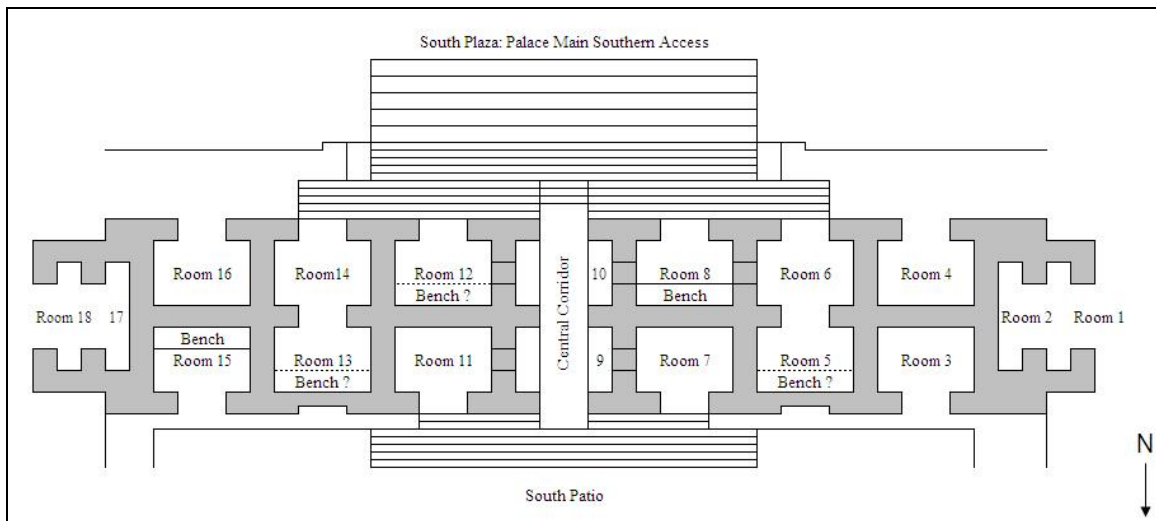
Layout (not to scale) of Structure L7-9 (Drawing by T. Barrientos)
